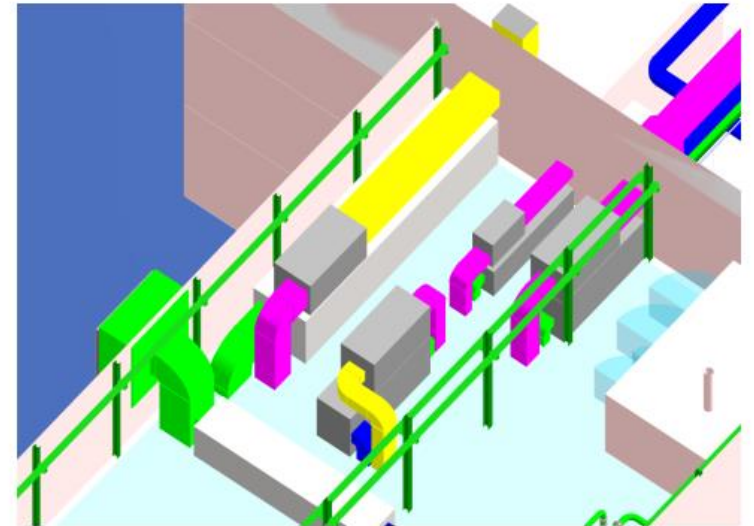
Layout of ventilation units in a dedicated area of the auxiliary building, including all ventilation units for the target complex, the auxiliary building, and the extraction tunnel.
